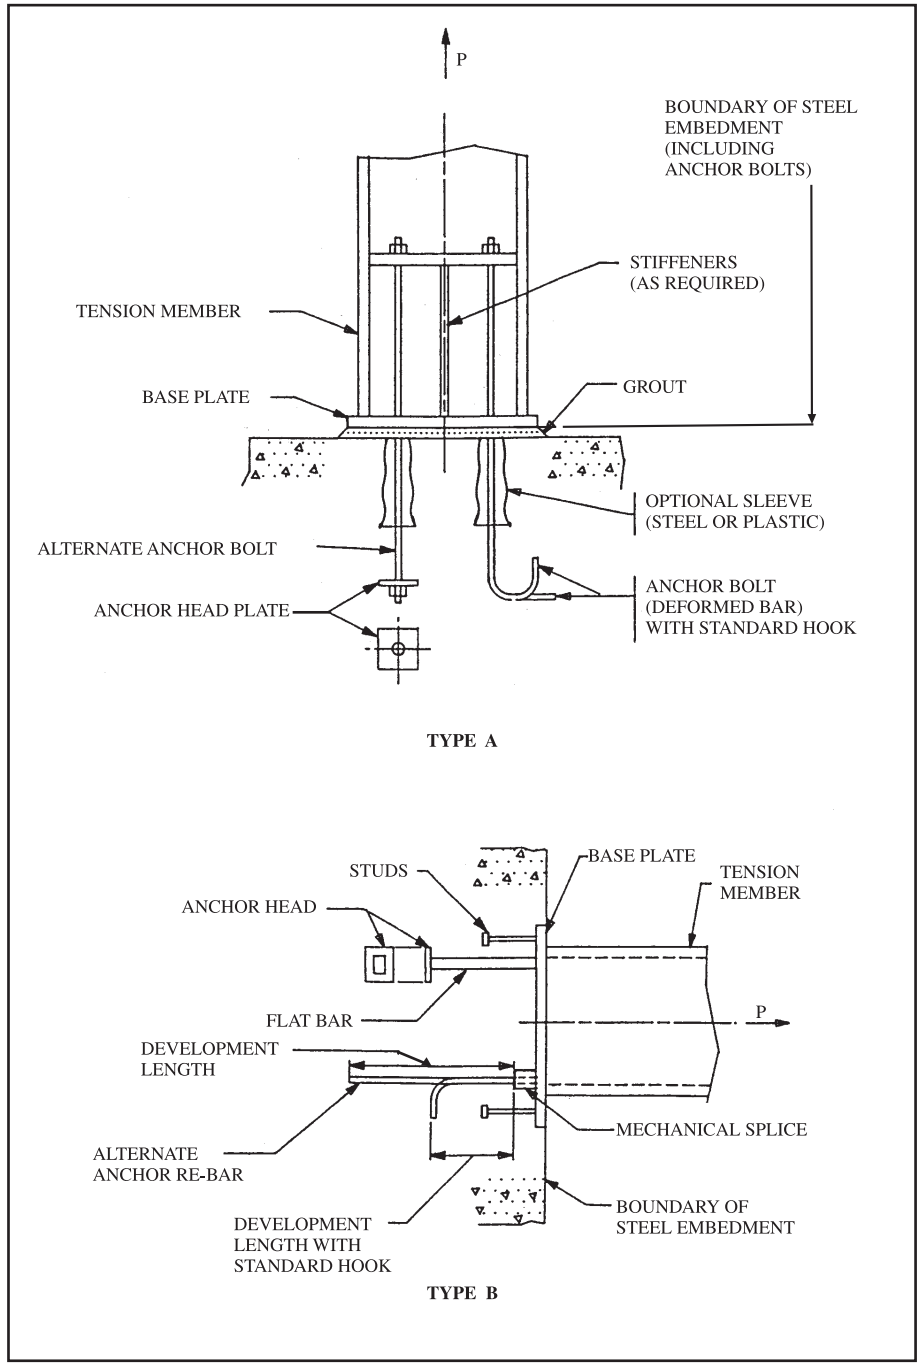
TENSION EMBEDMENTS - TYPICAL EMBEDMENT DETAILS
